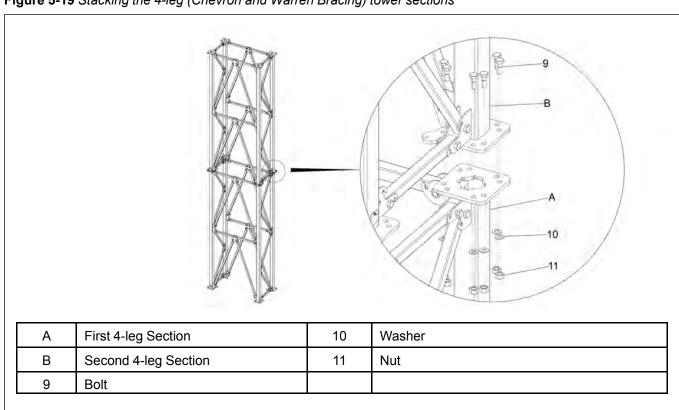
Stacking the 4-leg (Chevron and Warren Bracing) tower sections
